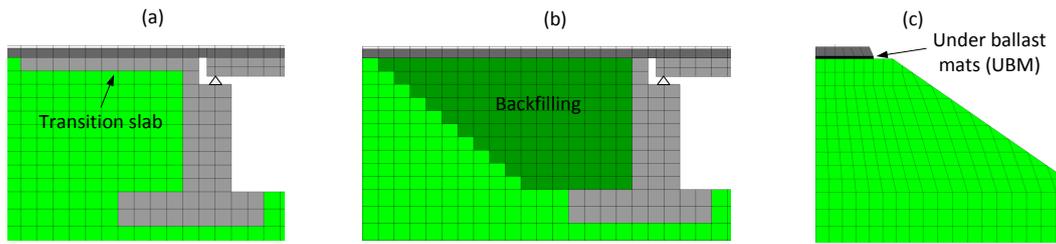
Approaches for transition zones: (a) transition slab, (b) backfilling area, (c) under ballast mats (UBM).
